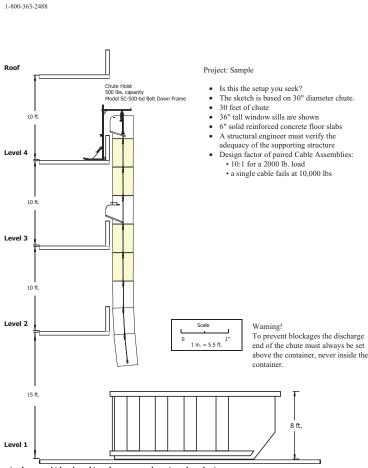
Sample site sketch, with bolt-down chute hoist.
